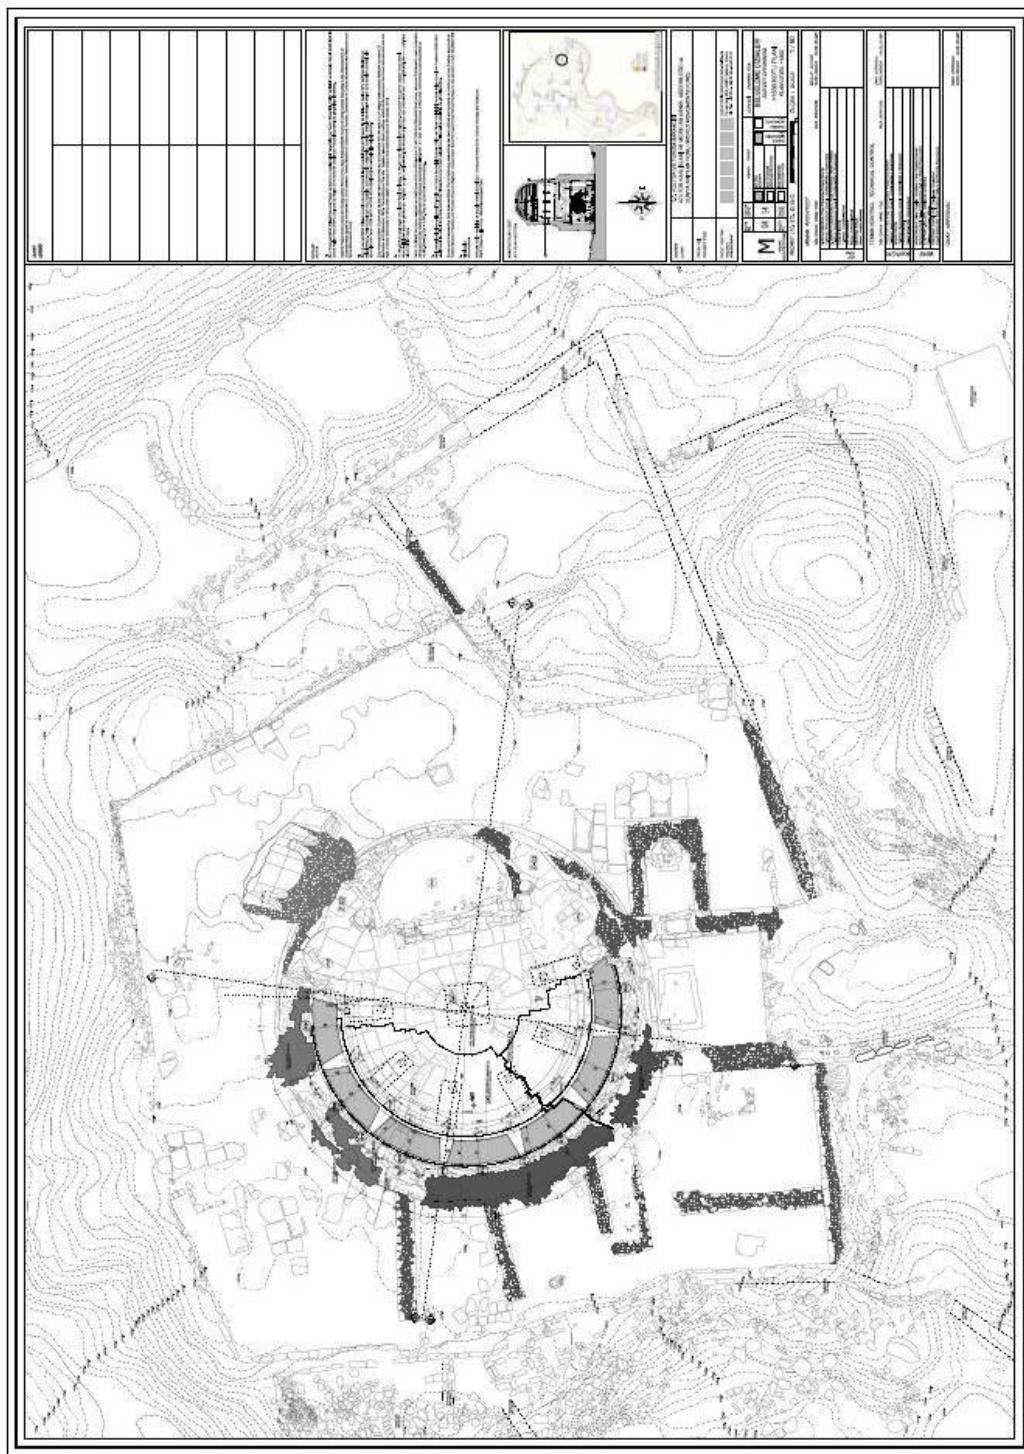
Plan at level +1500 meters, Historic Preservation Project of Sub Amena P'rkich Church, Promet Projekti Ltd. Sti. 2012
